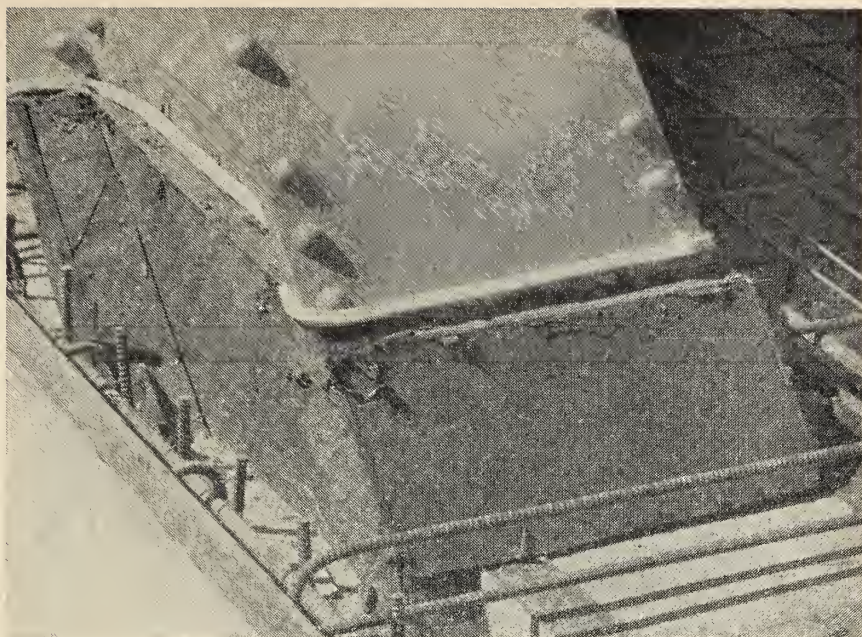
Bituminous Fibre to Isolate Truss Member from Concrete. White strip is foam rubber forming caulking groove.
